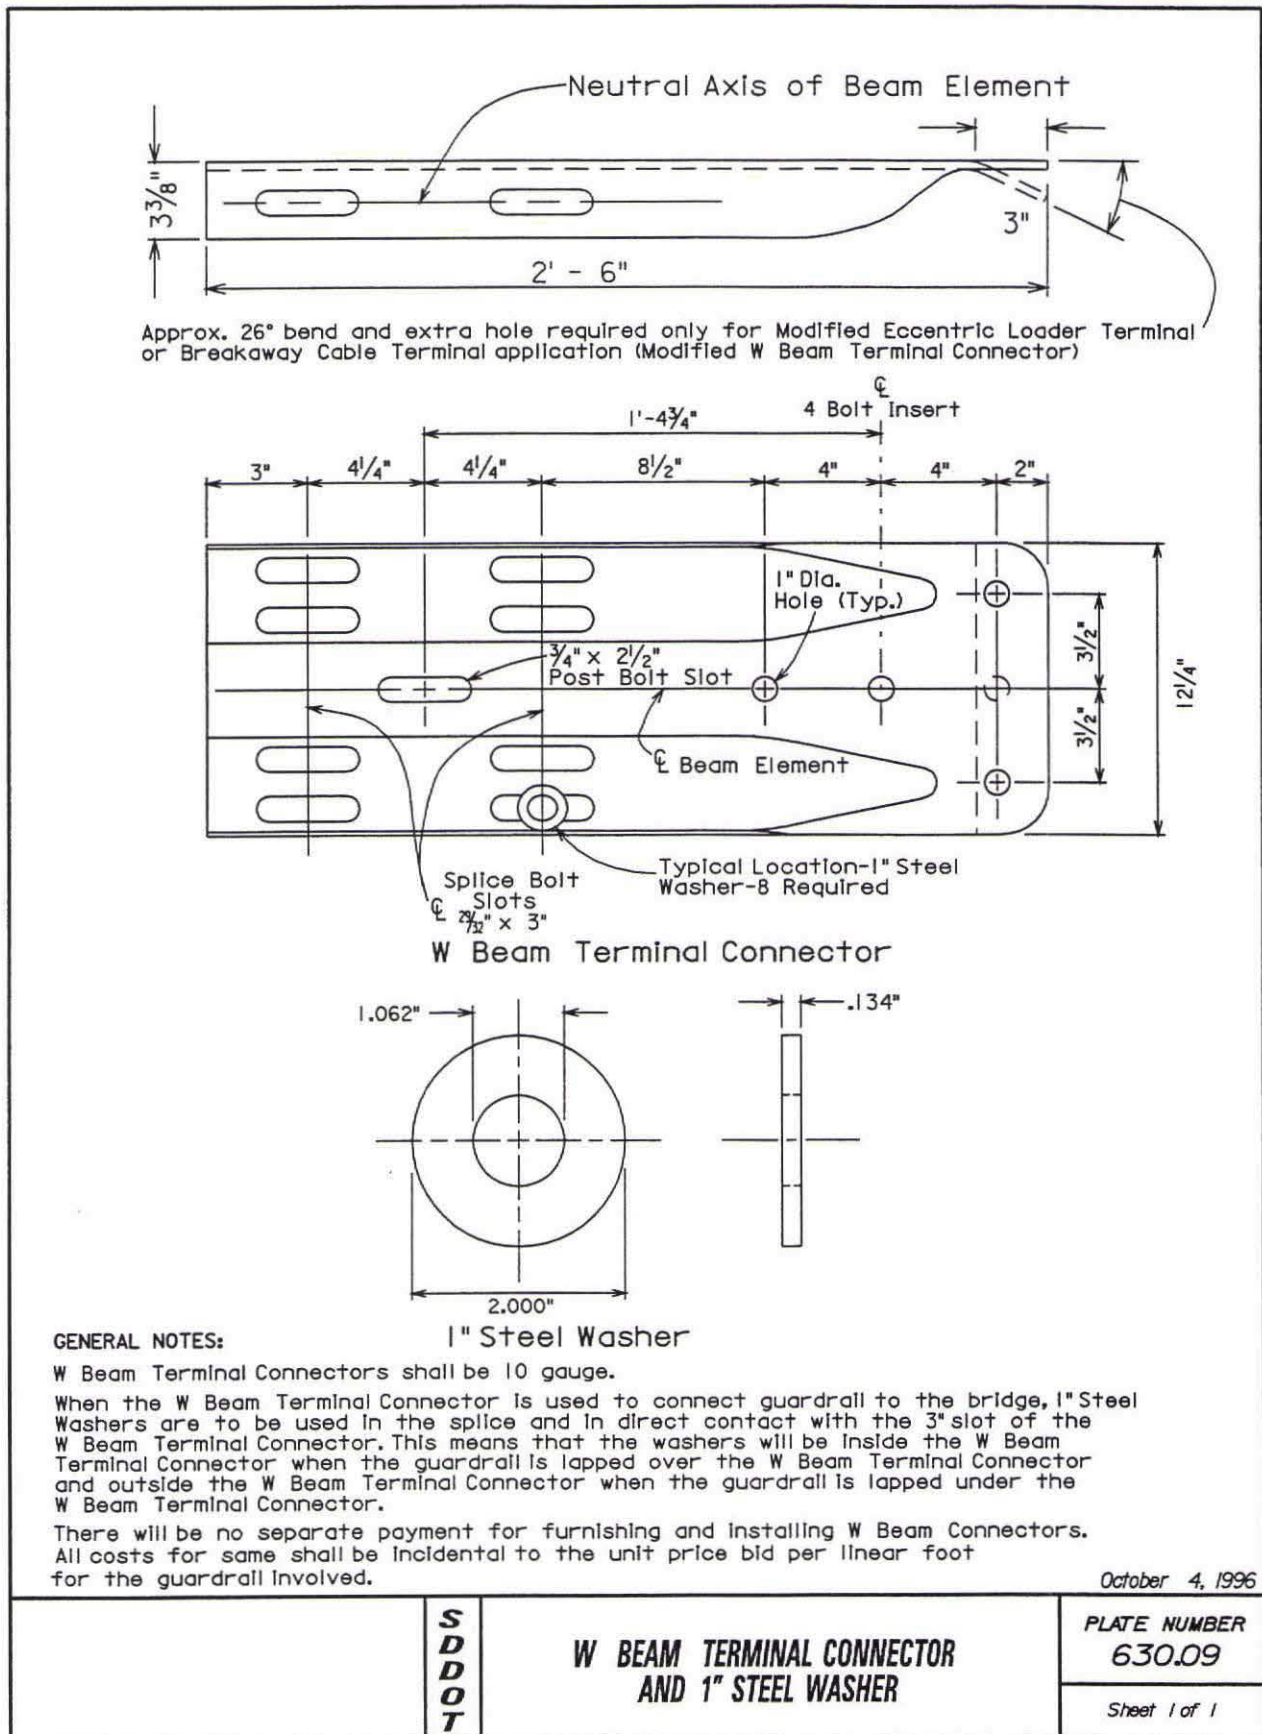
Cable Guardrail to W-Beam Transition Design Details (Continued)
